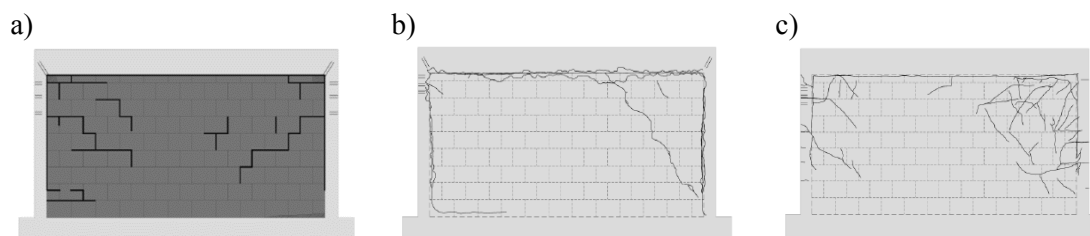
Crack patterns of test specimens a) Wall-Ref-01 b) Wall-Ref-02 c) Wall-JAR
